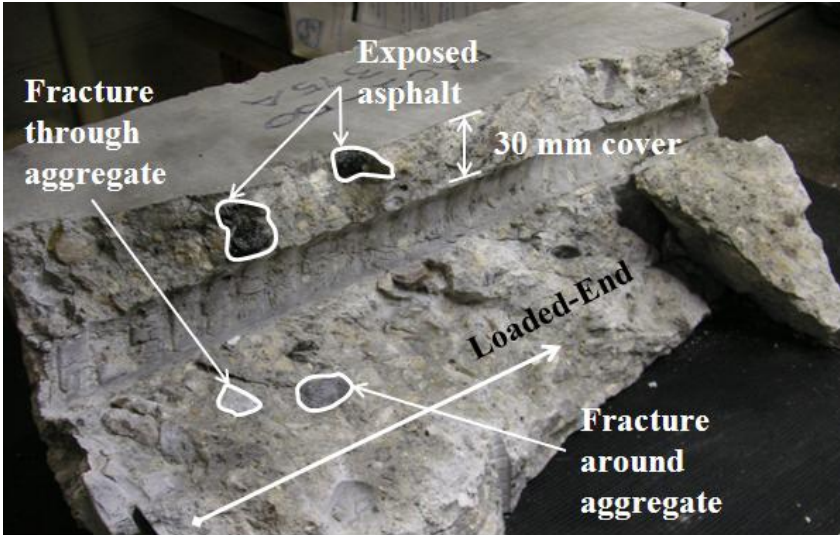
Main failure planes through concrete cover (dissected BE-RAC2-50-375A)
